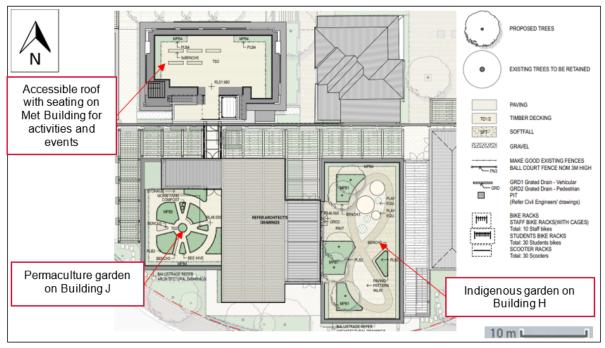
| Proposed rooftop landscaping (Source: Applicant's RtS 2020)
